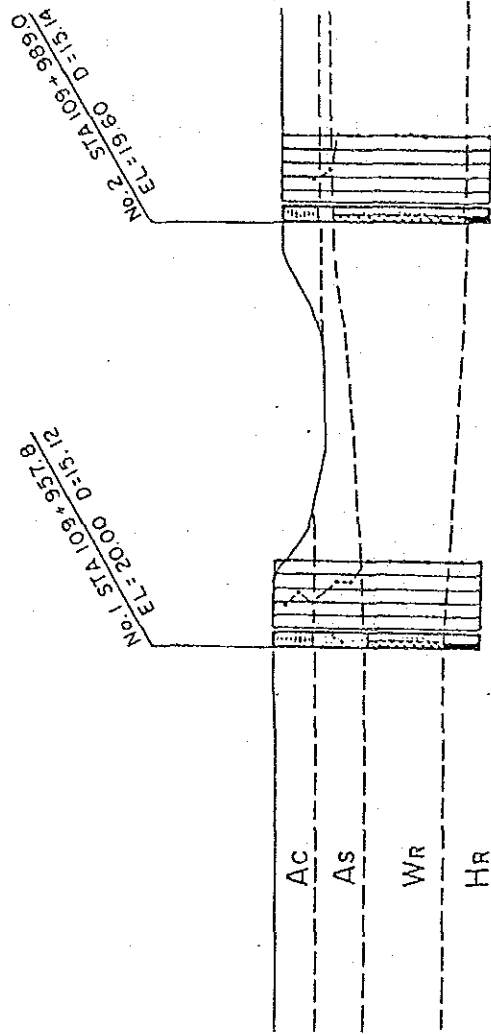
(6/10) COLUMNAR SECTION BORING LOG AND GEOLOGY
